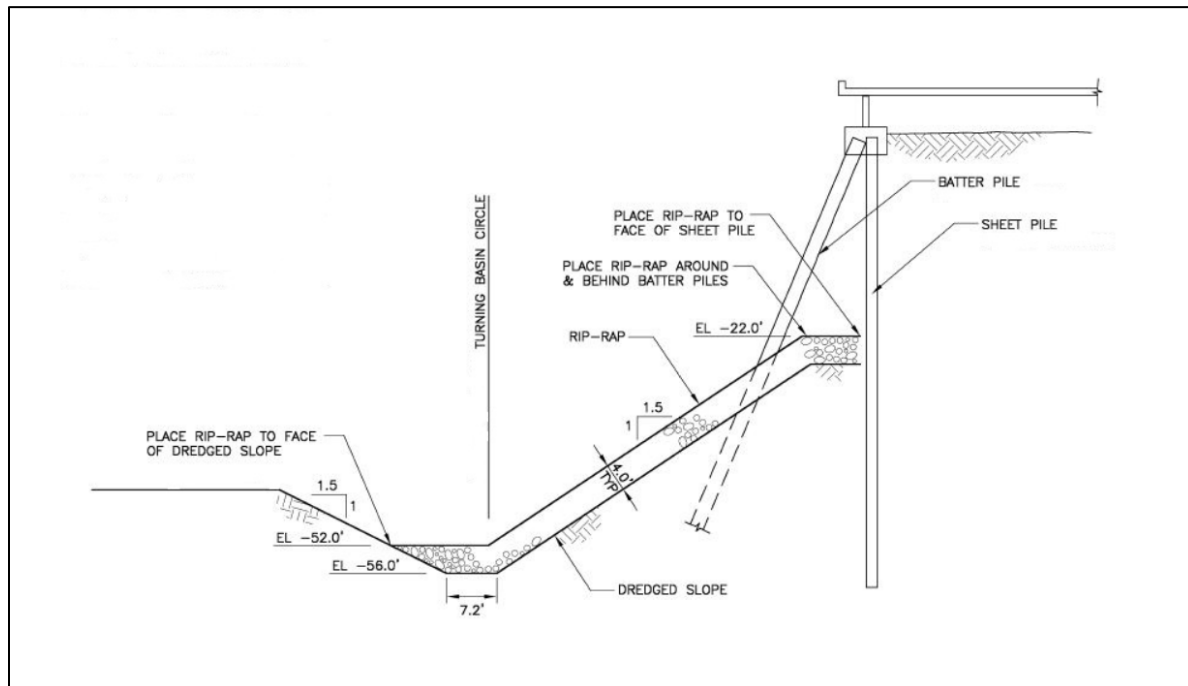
Preliminary Bulkhead Wall Cross-Section
